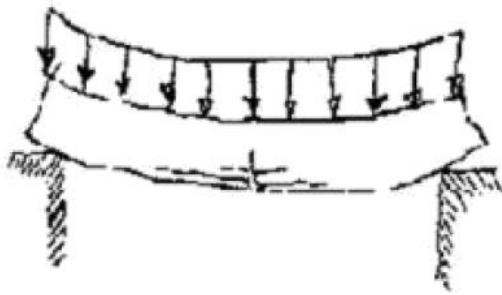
Truss Failure Due to Excessive Roof Load [26]
